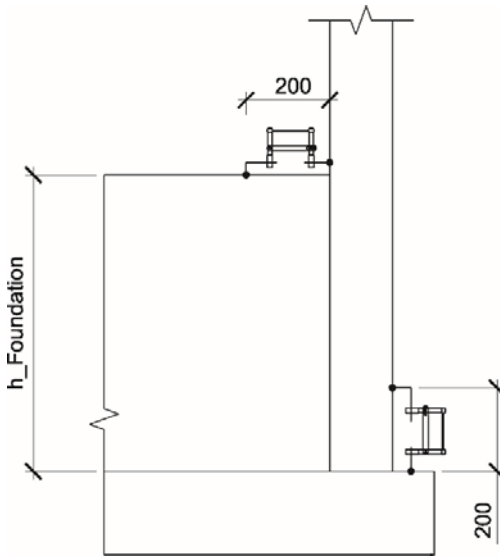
Instrument layout for panels with 450 mm tall foundations. All dimensions in mm, “PG” refers to portal gauge extensometers.
